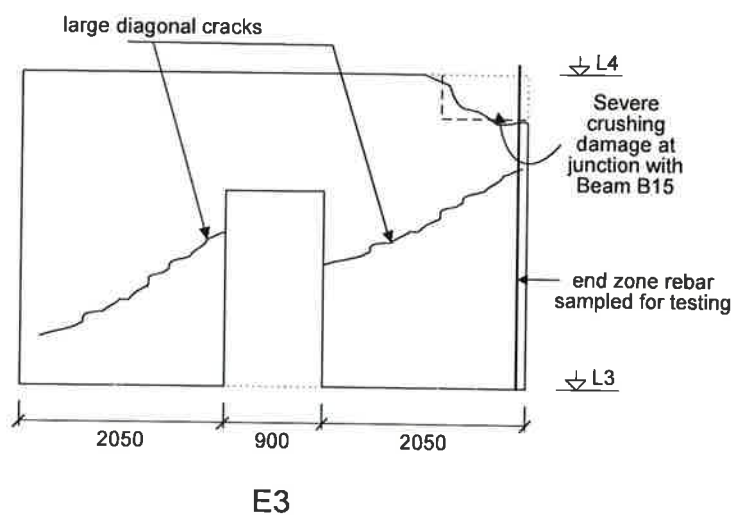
Line 1 South Wall remnant E3, Level 3 to 4.
